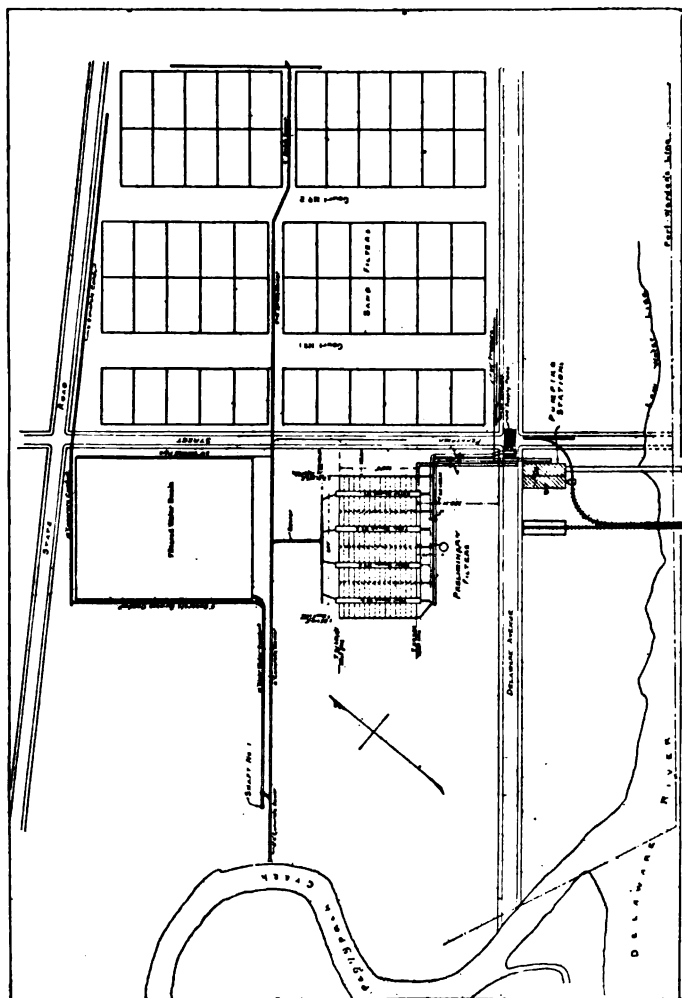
PLAN OF TORRESDALE FILTER PLANT, SHOWING PUMPING STATION, PRELIMINARY FILTERS, 55 OF THE 65 SLOW FILTERS, FILTERED WATER BASIN, AND BEGINNING OF TORRESDALE CONDUIT.
